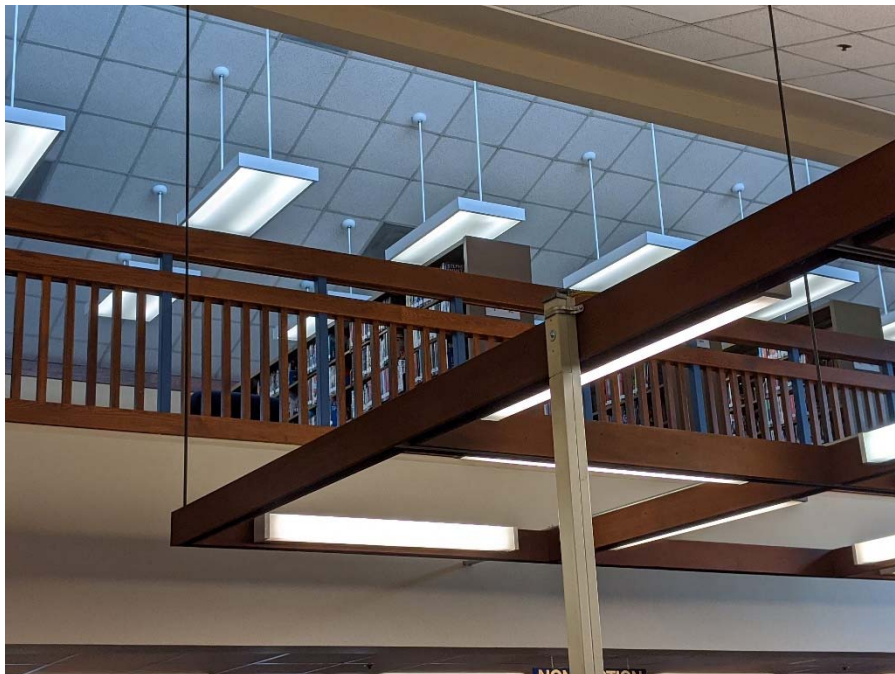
New Library – 1st Floor Looking West & Up to 2nd Floor
